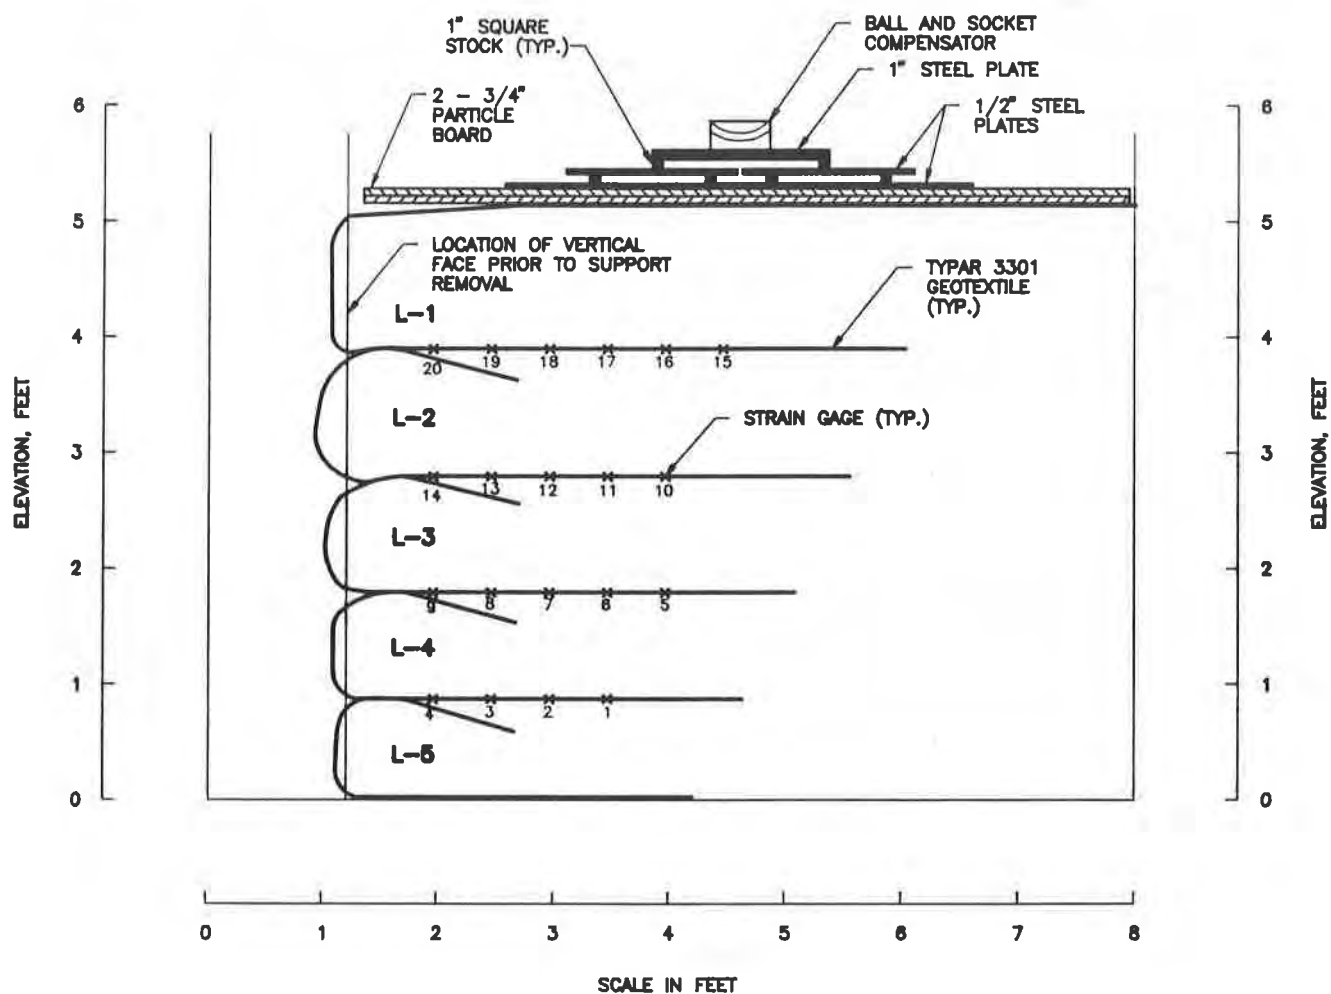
TEST WALL GEOMETRY AS CONSTRUCTED
